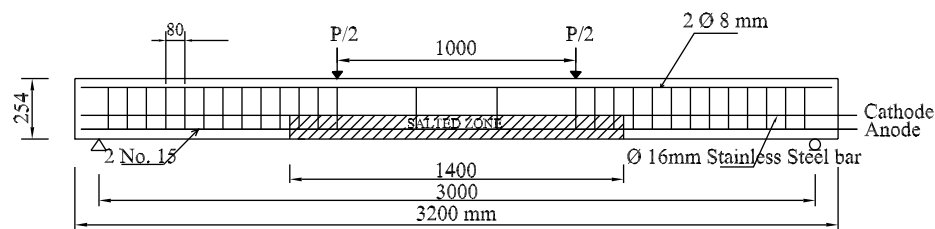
Typical dimensions and reinforcement details of the test specimen.
